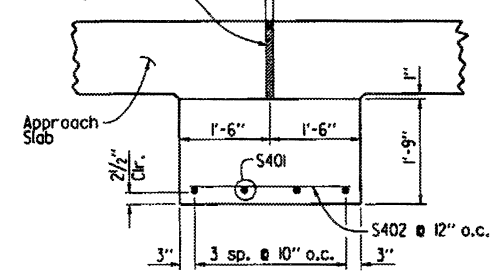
DETAILS OF LONGITUDINAL CONSTRUCTION JOINT
